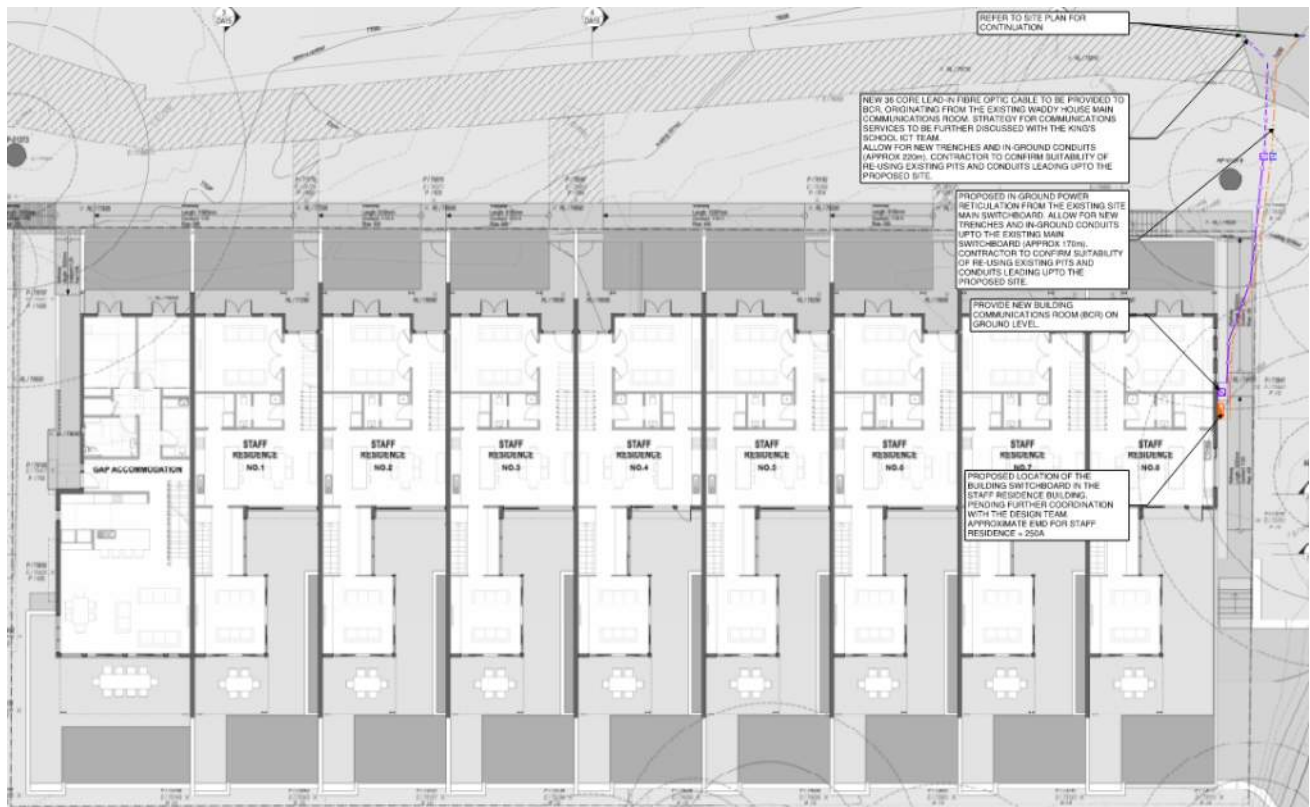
STAFF RESIDENCES ELECTRICAL INFRASTRUCTURE SITE PLAN
